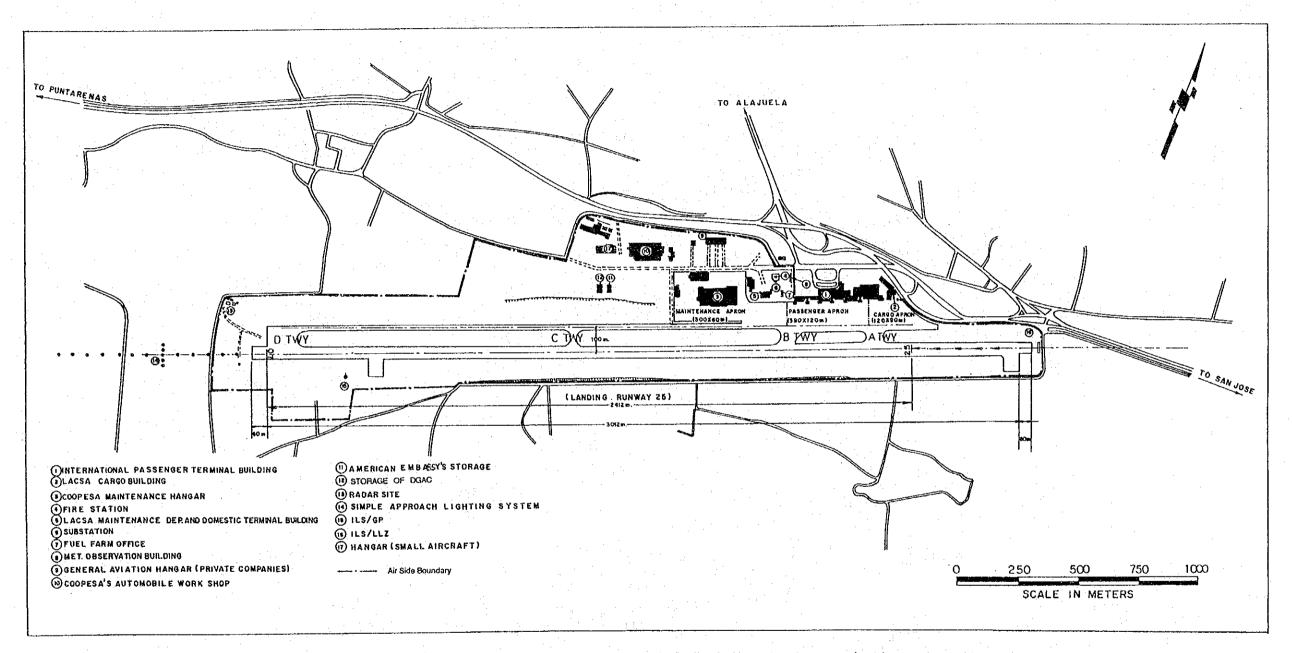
Layout Plan of Existing Juan Santamaria Airport
